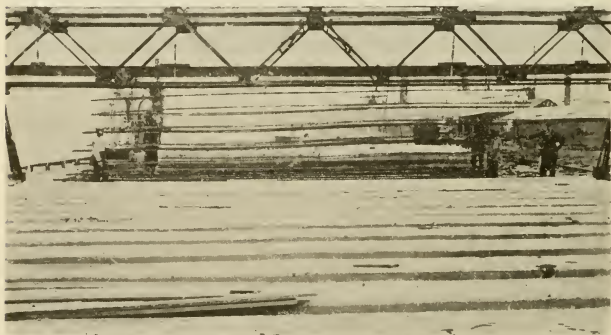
CASTING YARD FOR CONCRETE PILES.
